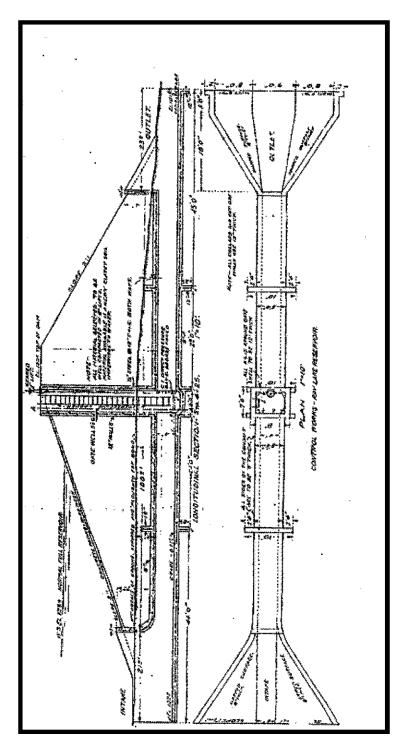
1920 drawing of Ray Lake Dam Outlet Works
